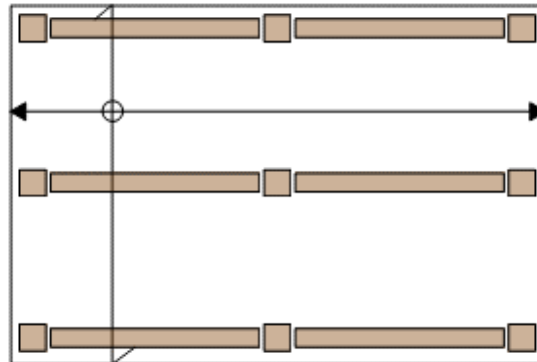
Post-and-beam concept plan view (courtesy of Aspect Structural Engineers).
